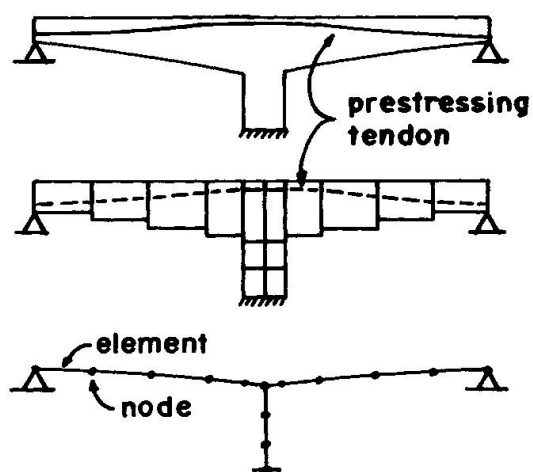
ACTUAL AND IDEALIZED PRESTRESSED CONCRETE FRAME
